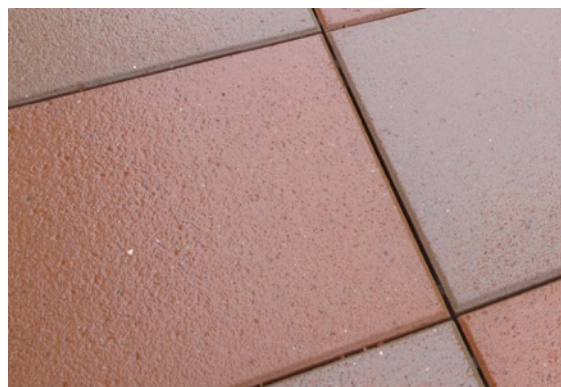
Site 18 outdoor art classroom concrete tile (detail).
